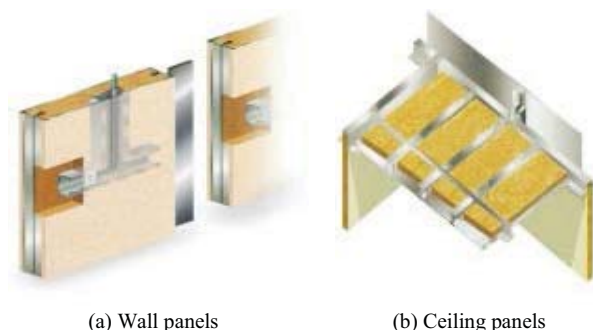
Wall and Ceiling Panels of the Modules (STACO, 2012)
